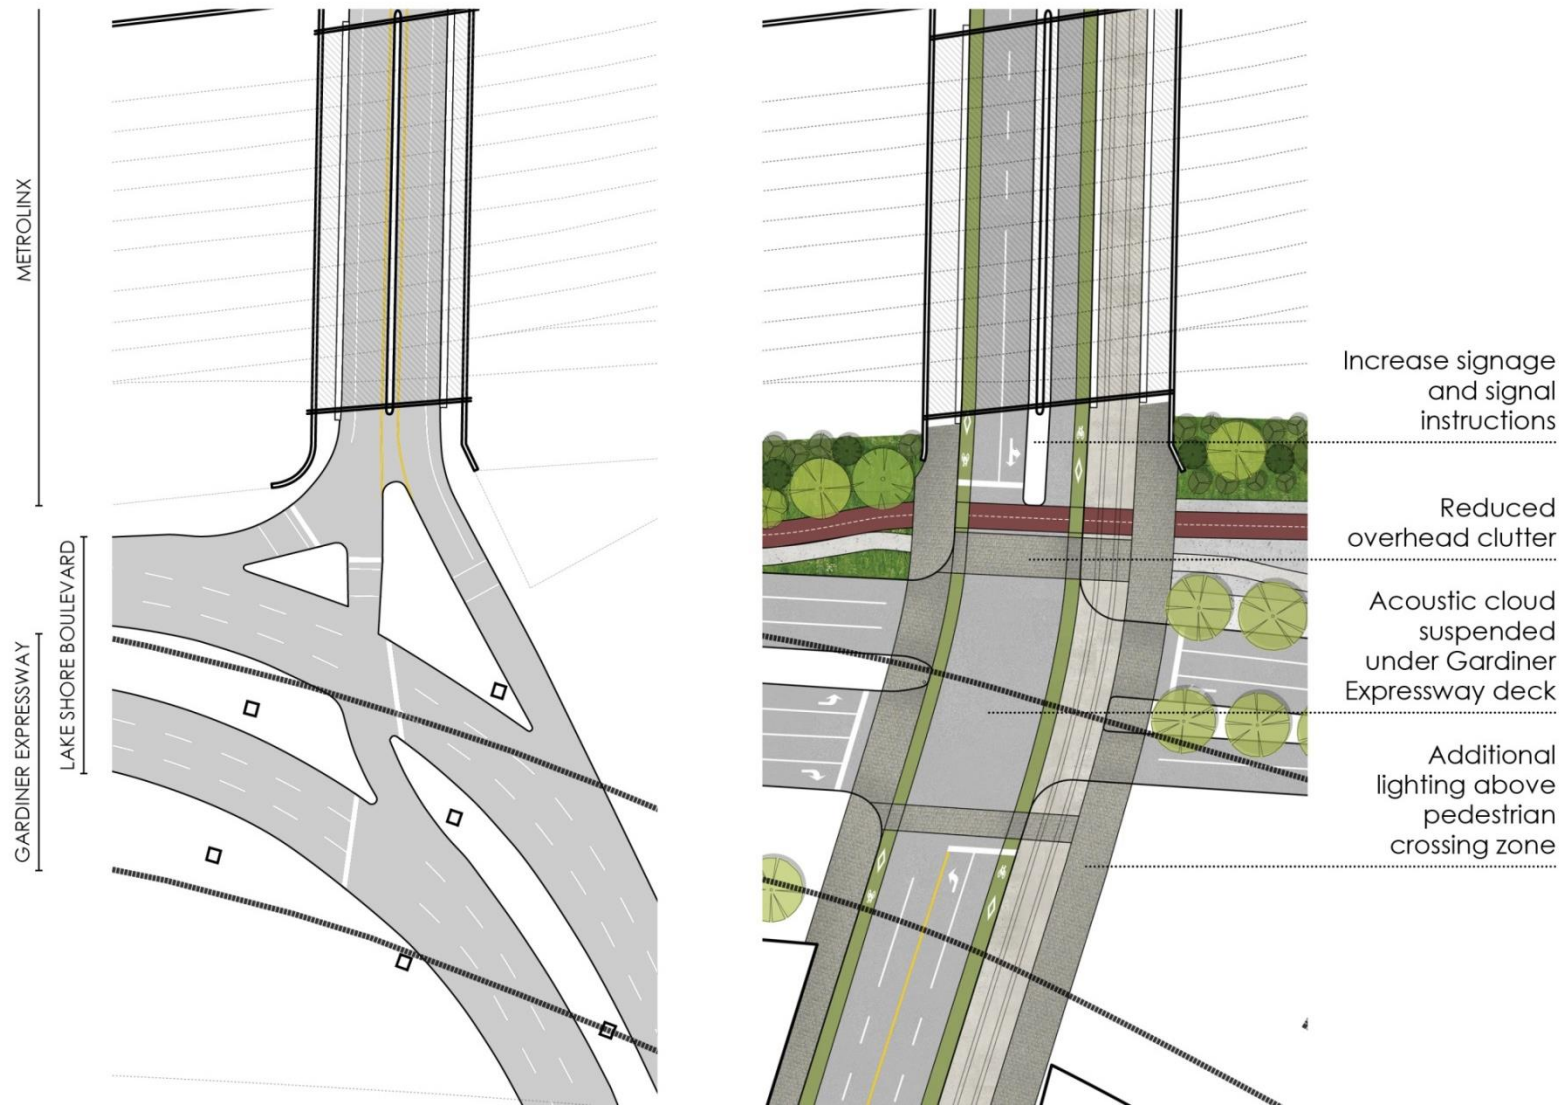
Proposed Cherry Street and Lake Shore Boulevard Intersection Design for Design Alternatives 2 and 3
